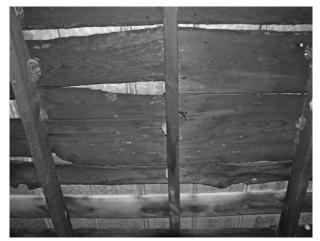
View of decking on south slope of logpen roof, showing typical 1840s slab-wood decking.
